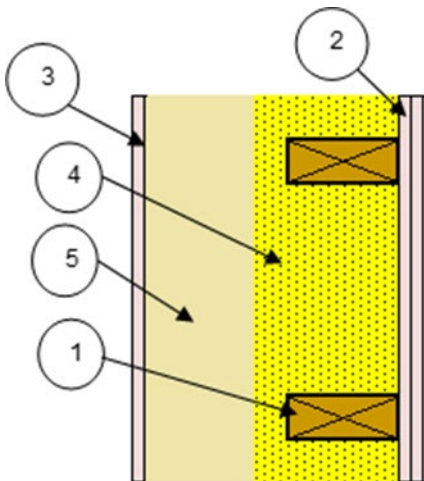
Combination of massive timber panel and timber framed wall – Section view
